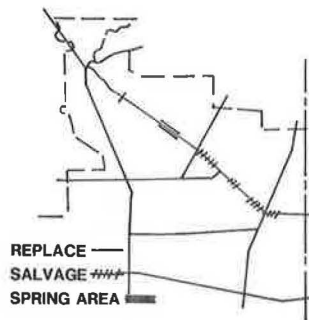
Location of salvage sections, replacement sections, and spring area.
